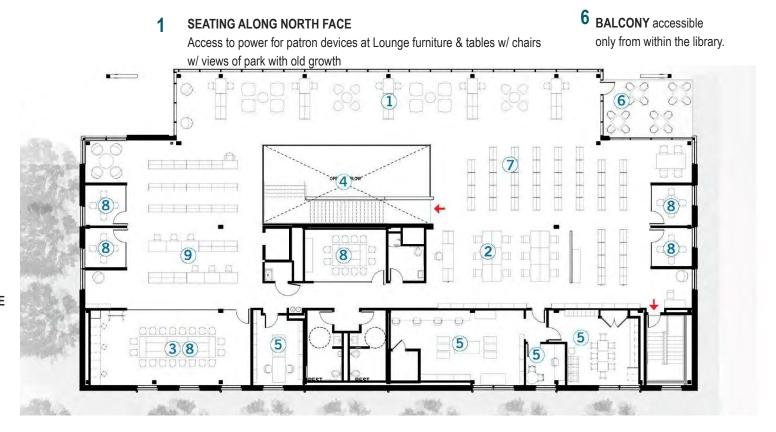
EXHIBIT: SOUTHWEST LIBRARY, SECOND FLOOR PLAN
